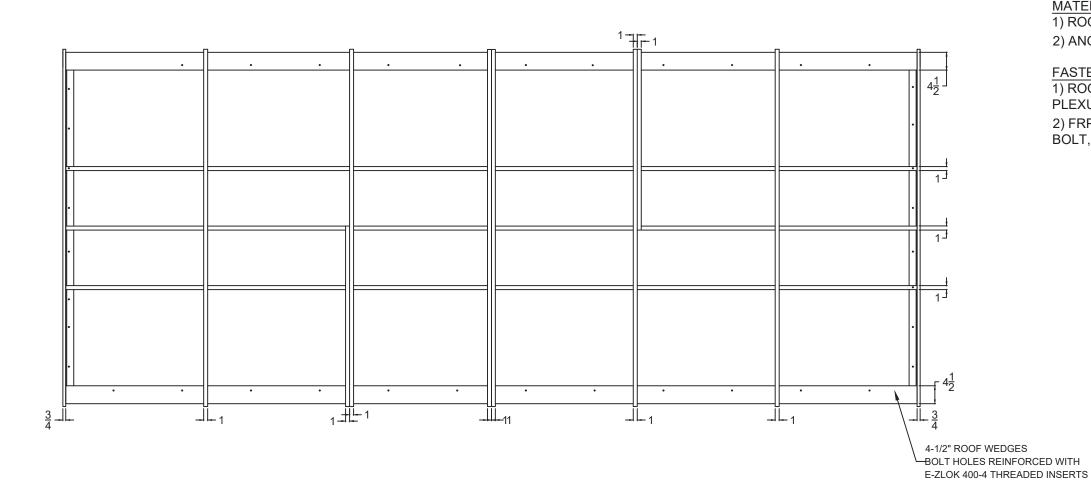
DETAIL F NOTE: THIS IS IN ADDITION TO CORNER BEAM ASSEMBLY, SEE DETAIL C
